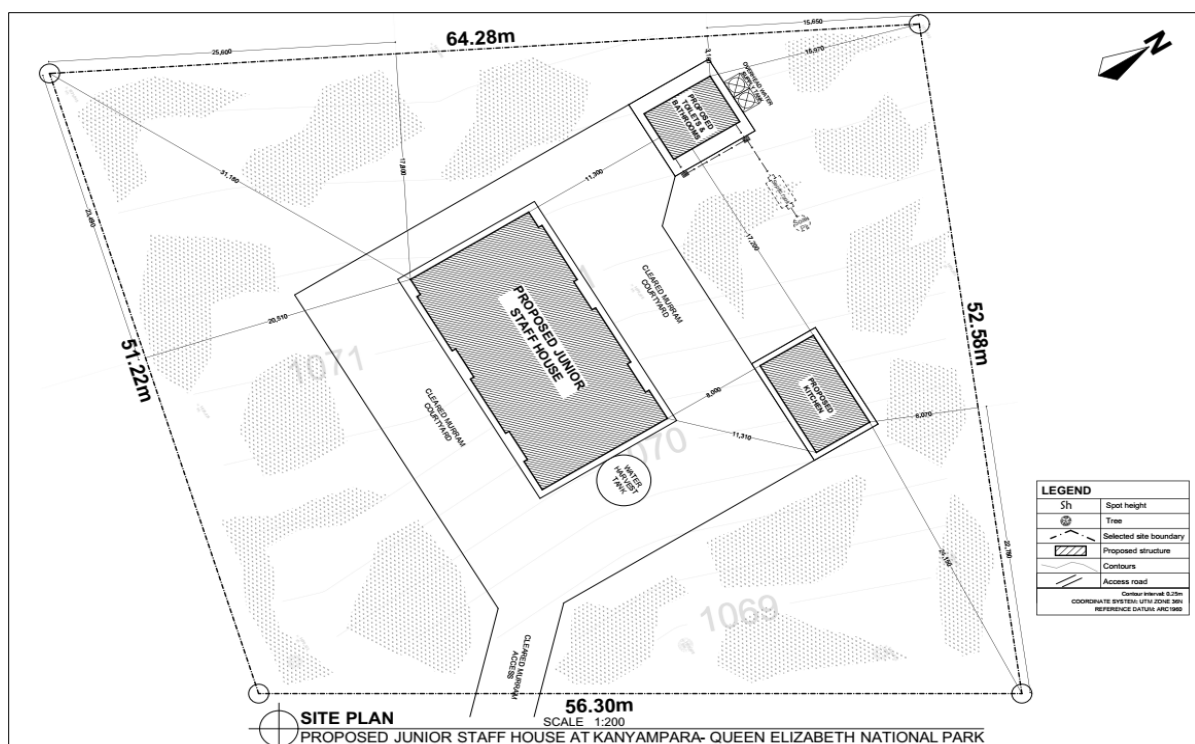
Kanyampara Junior Staff Accommodation Site Plan
